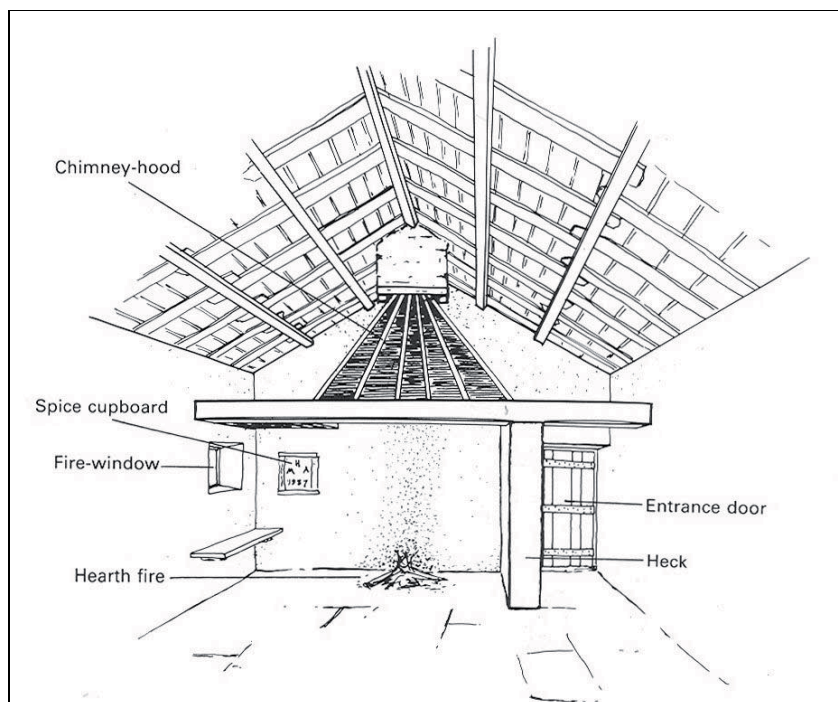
Sketch showing how the original fireplace may have looked in the earliest phase of the house (Source: Denyer 1991)
